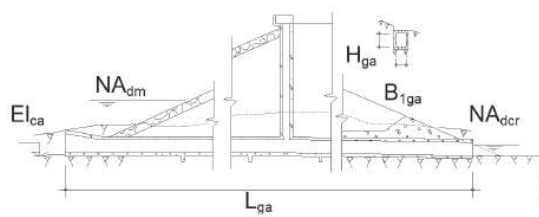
Cross-section and longitudinal section of a diversion gallery in a dam.
